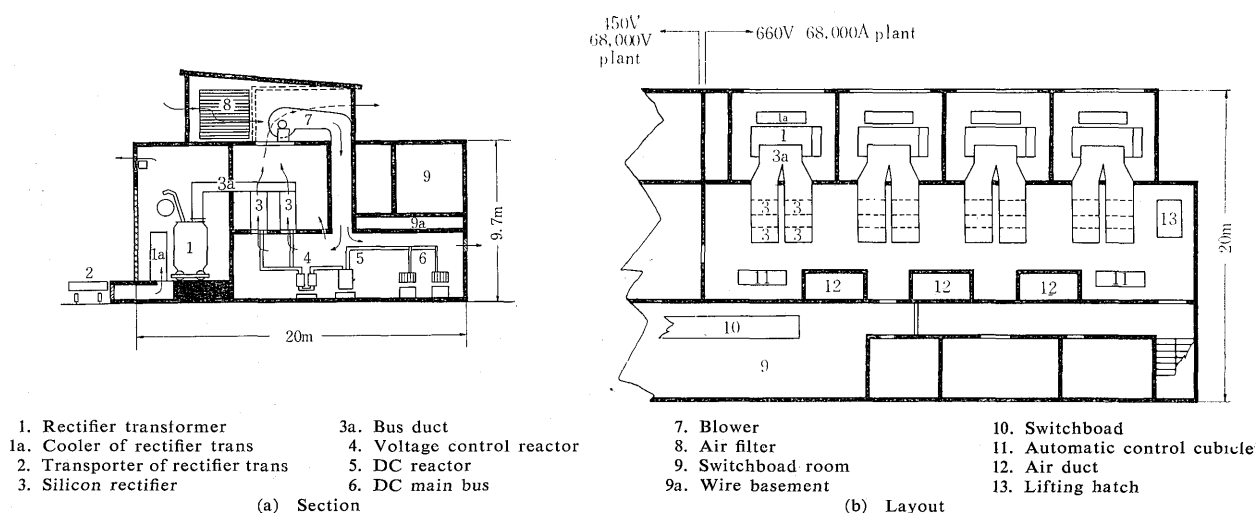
Machine arrangement of 660 V 68,000 A equipment for Nippon Light Metal Co.
